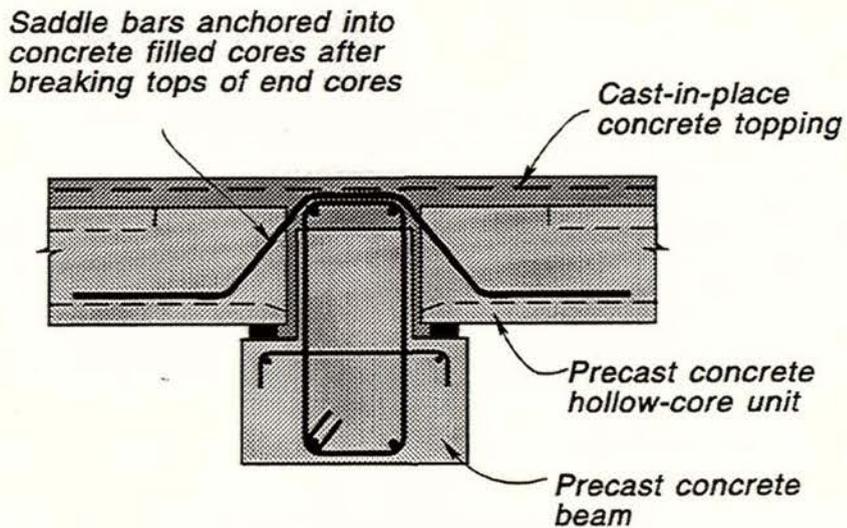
Saddle Bars for Precast Hollow-Core Units According to the New Zealand Guidelines [1]
